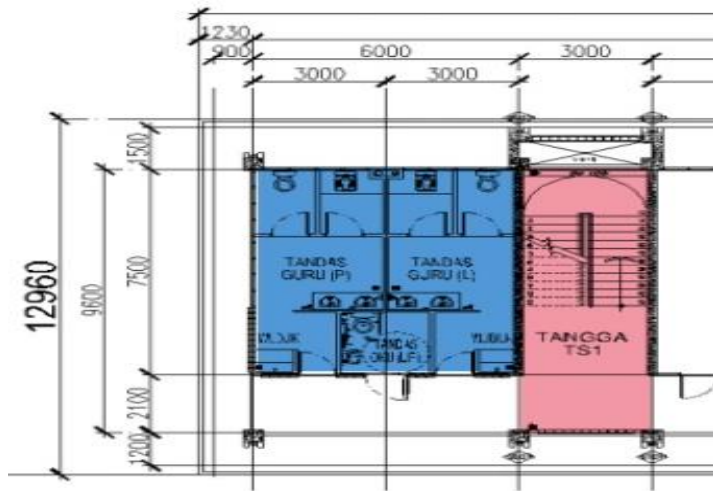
Teacher (female toilet, left and male toilet, right) and accessible toilets (front) with details on ground floor) (Source: Pre-Approval Plans Flexible School Module, 2022).
